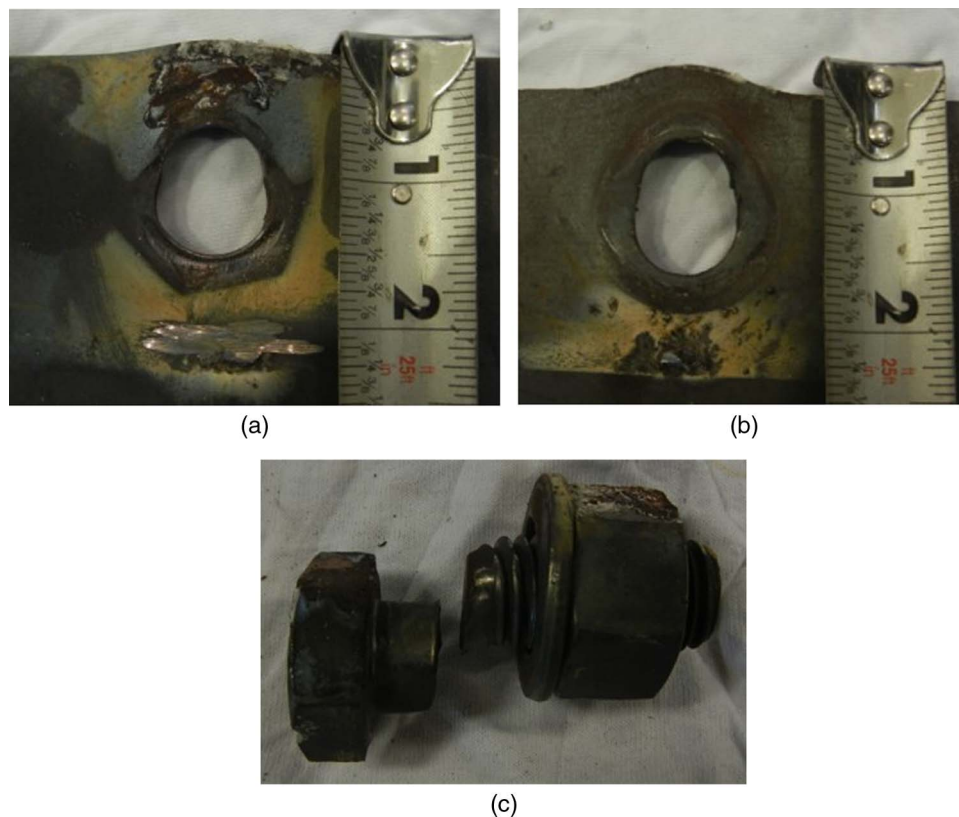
Specimen PB-7 lap-splice joint: (a) Plate 1; (b) Plate 2; (c) bolt shear fracture
